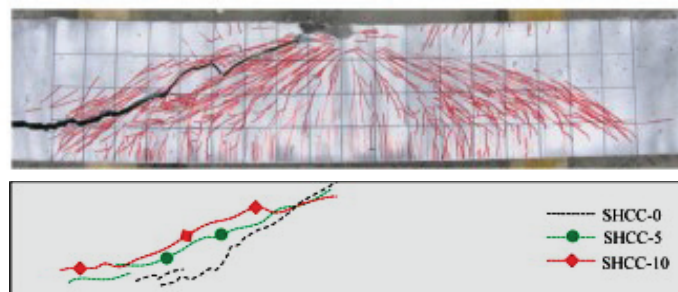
Positions of localized cracks. SHCC-0 is the RC beam without SHCC laminates. SHCC-5 and SHCC-10 are the RC beams with 5 mm and 10 mm thick SHCC laminates, respectively [43]
